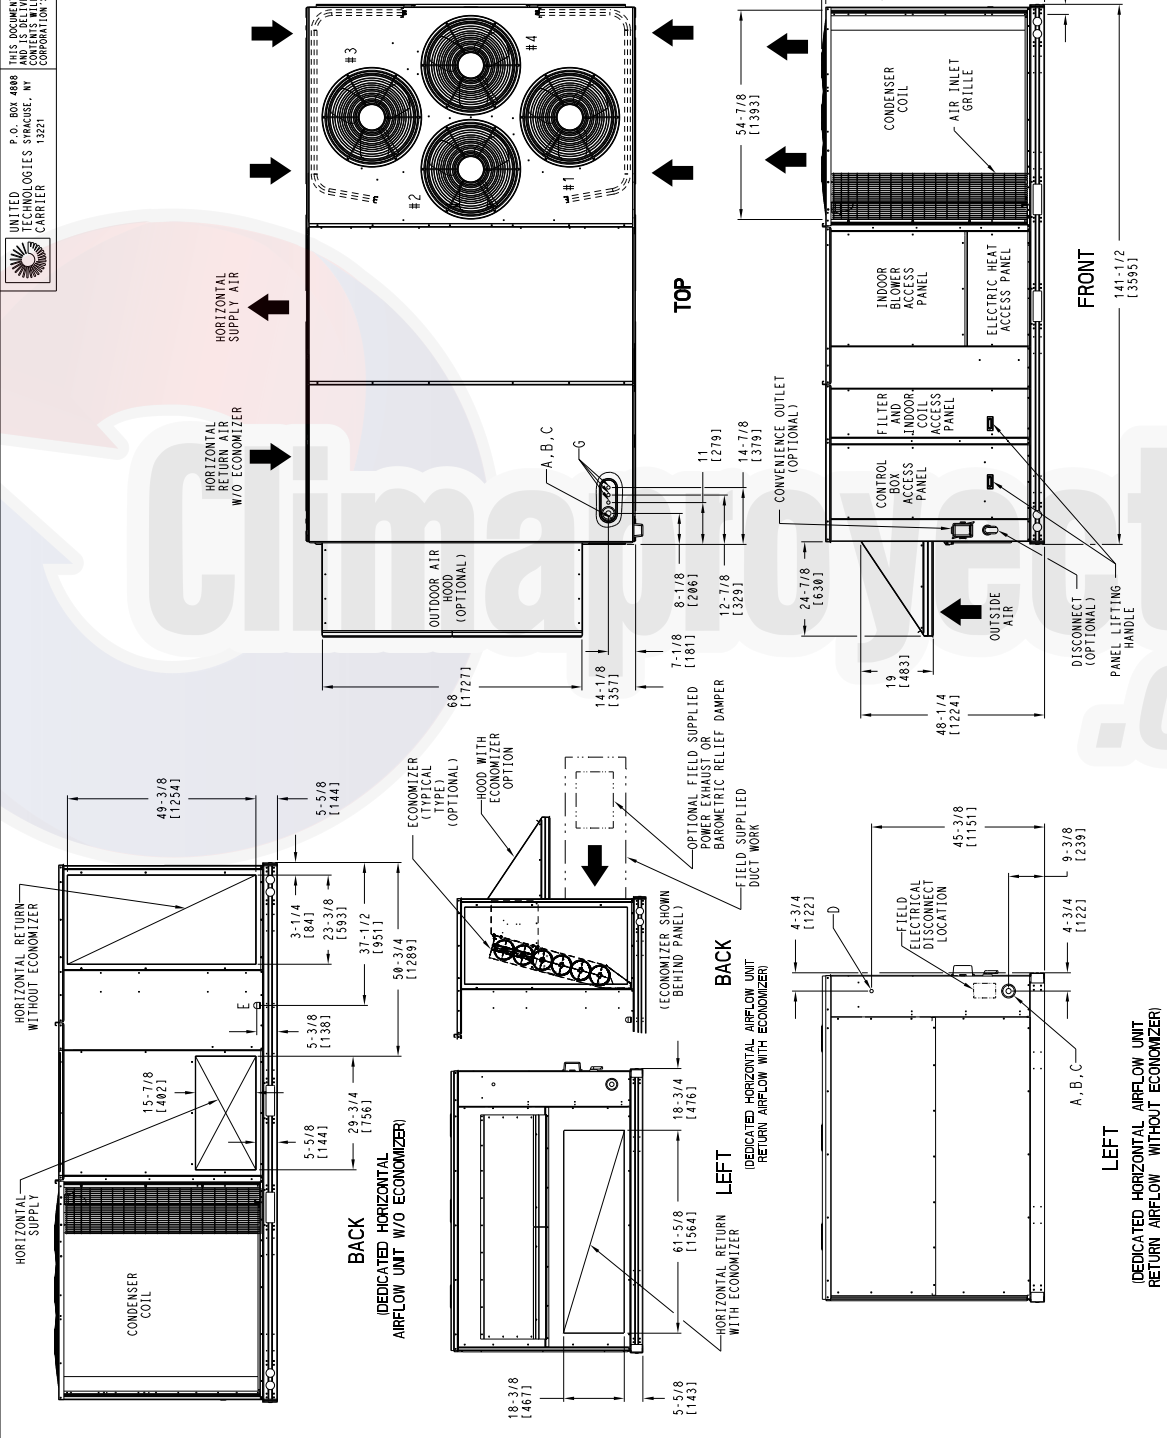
Unit Dimensional Drawing – 17 and 20 Size Units, Sheet 1 of 3
